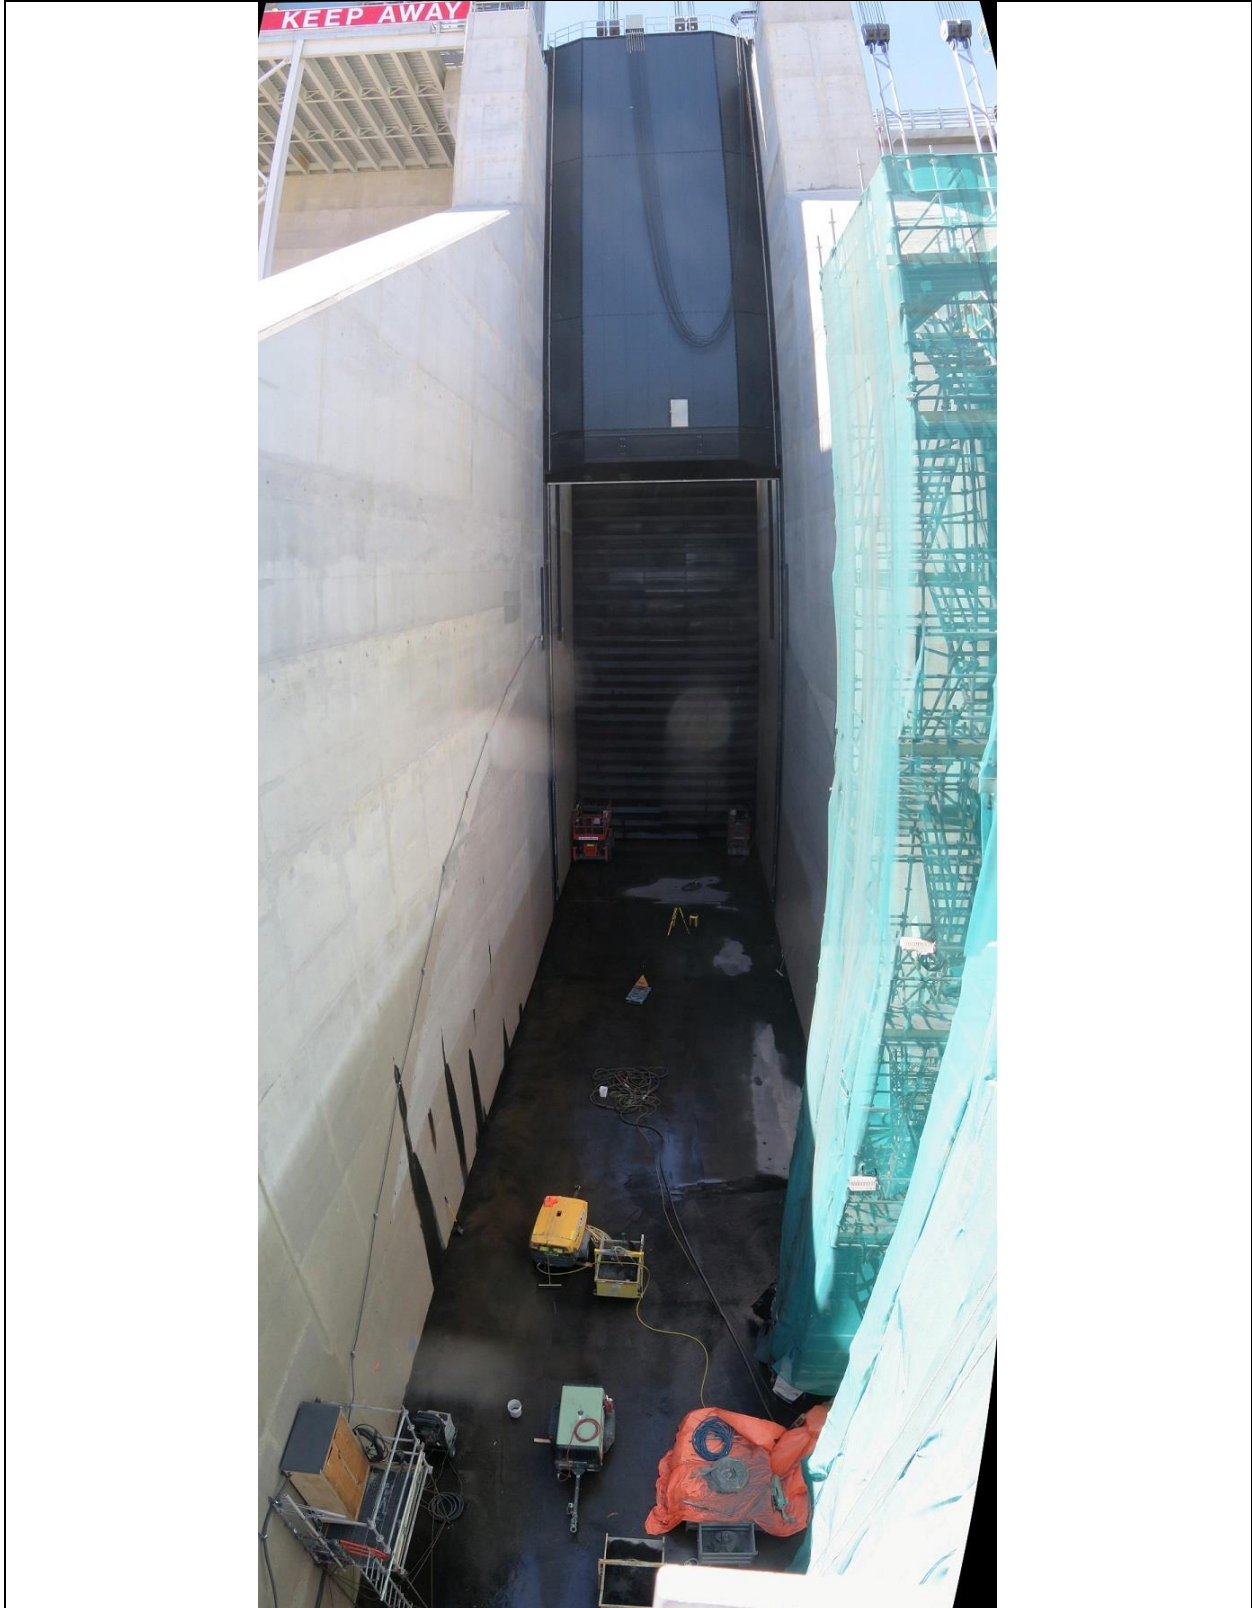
Looking upstream in spillway bay 1 where rollway construction works are starting. Service gate is in raised position at top of photo with stoplogs (visible below) closing the bay.
